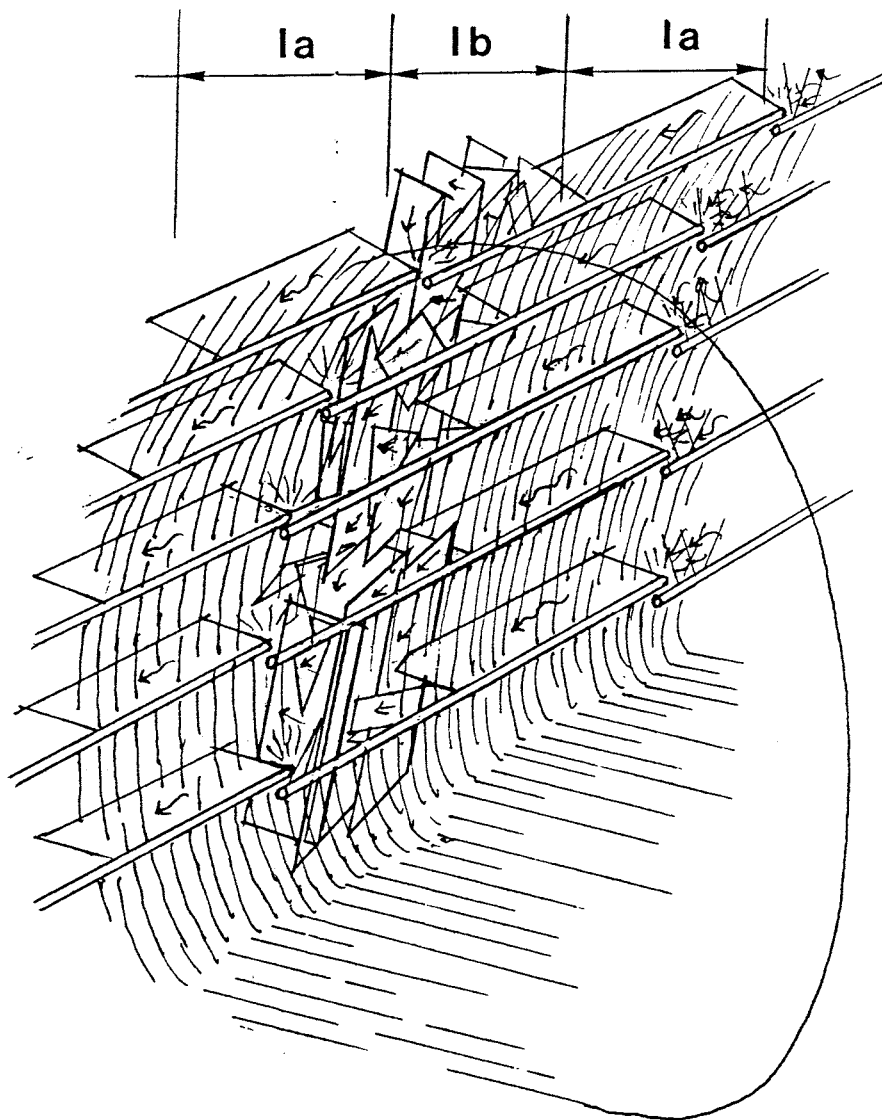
Schematic view of zones of blasting-induced defects in a tunnel wall. Ia represent zones of regular sets of plane fractures (Type I) extending radially from the blasted holes, the depth and length (in axial direction) being about 0.3 and 1.5 m, respectively, in the BMT case. Ib represents strongly fractured intermediate zone
